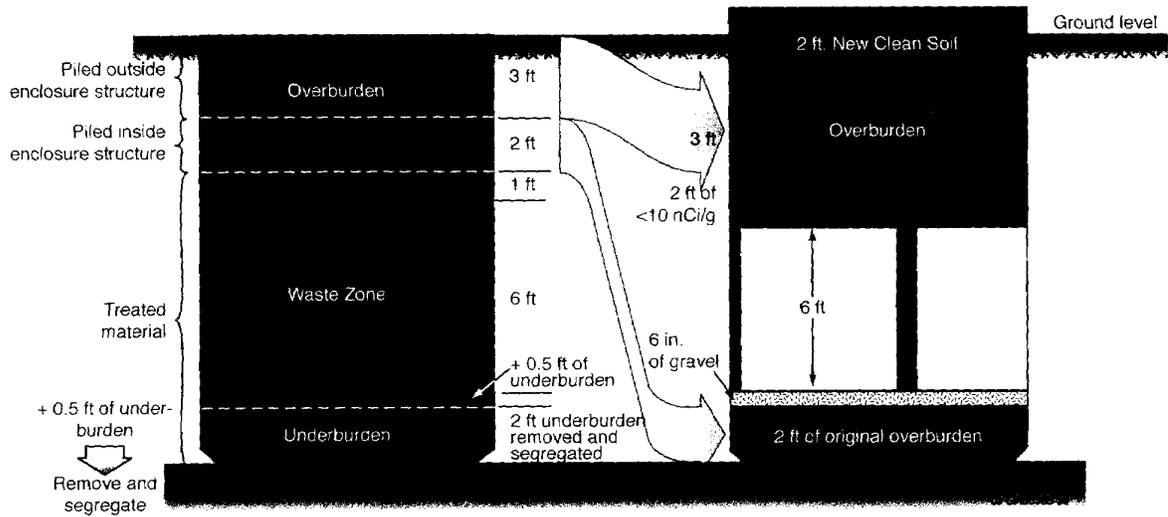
Cross-sectional view of the excavation site, both before and after retrieval.
